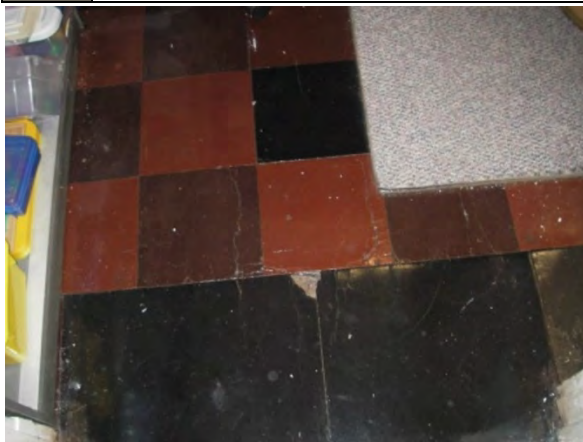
CLASSROOM FLOOR TILE IN POOR CONDITION
